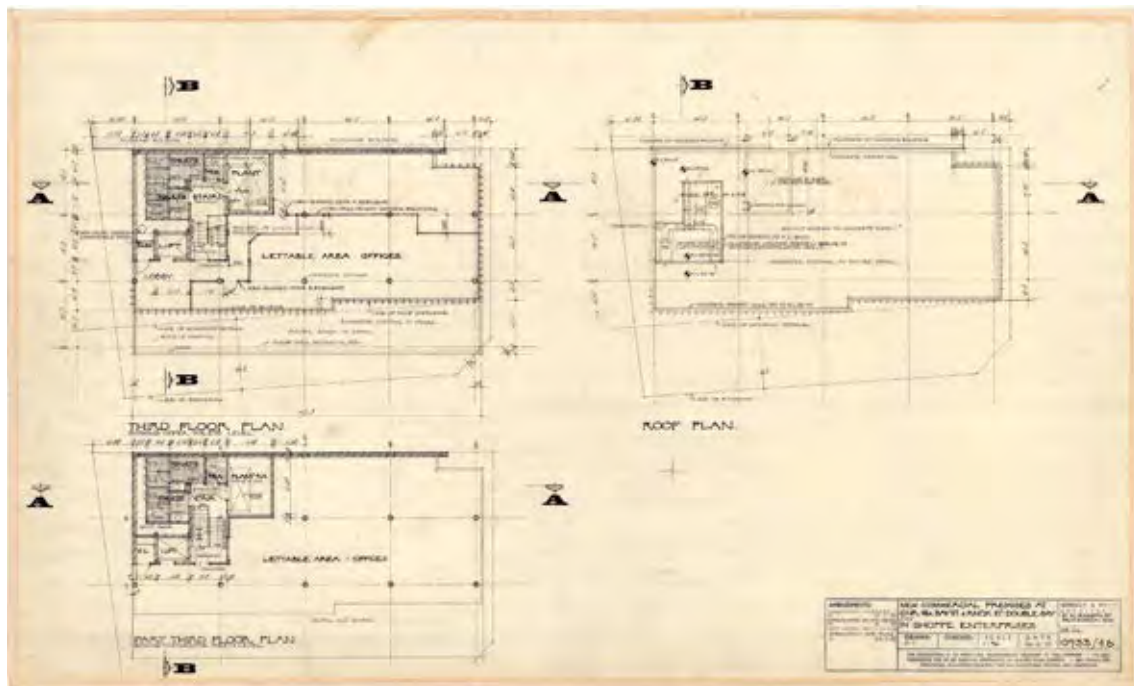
| Third floor plan of the Gergely & Pinter revisions. Again, the service areas and the structural system differ from the Gruzman design. The roof terrace paving was altered from terrazzo to plain concrete and the western elevation profile has changed with a step back in the south-west portion. (Source: Gergely & Pinter)
